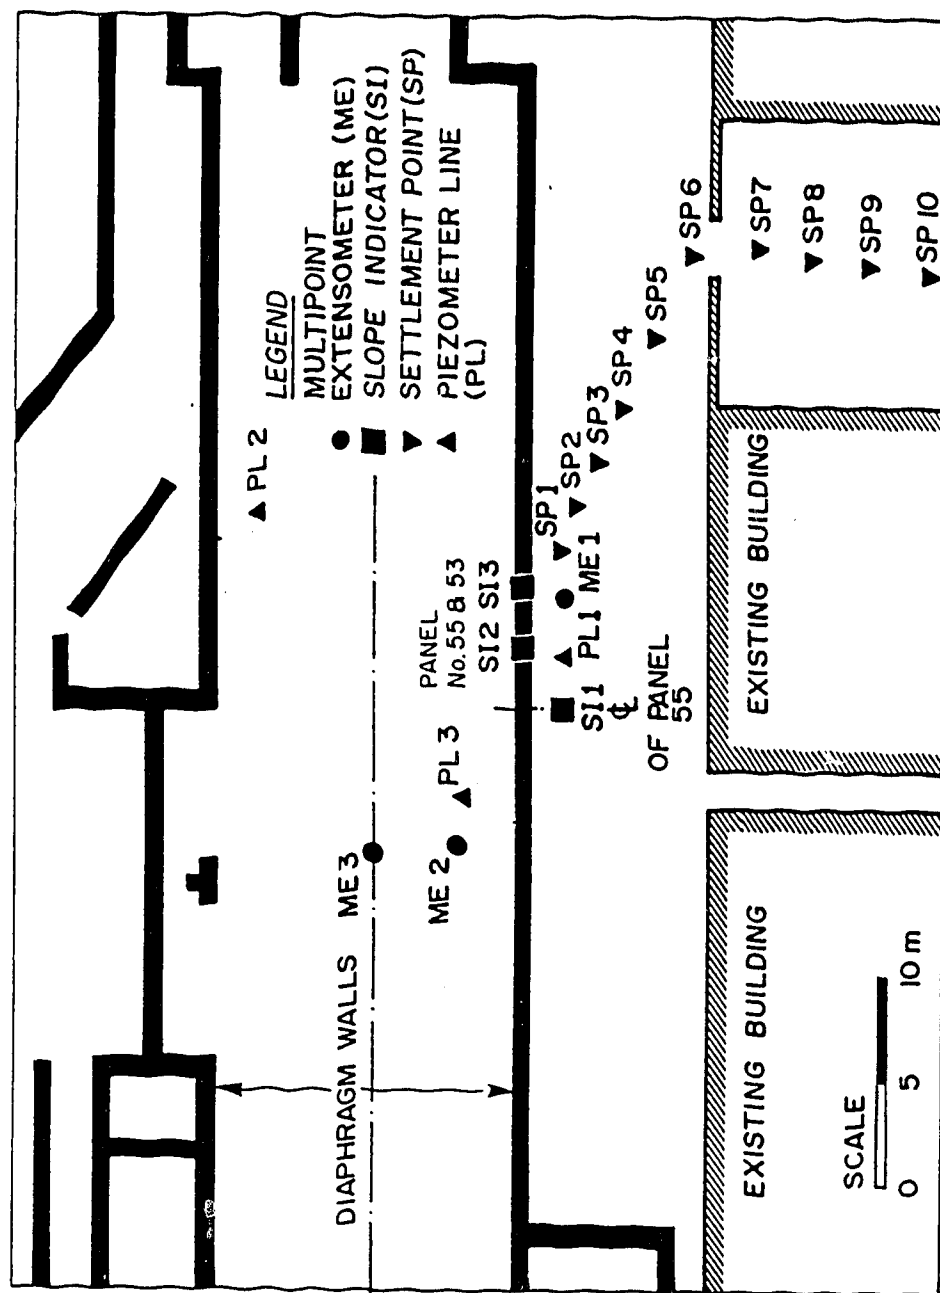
General Layout of the Instrumentation at Orabi Station Test Section
